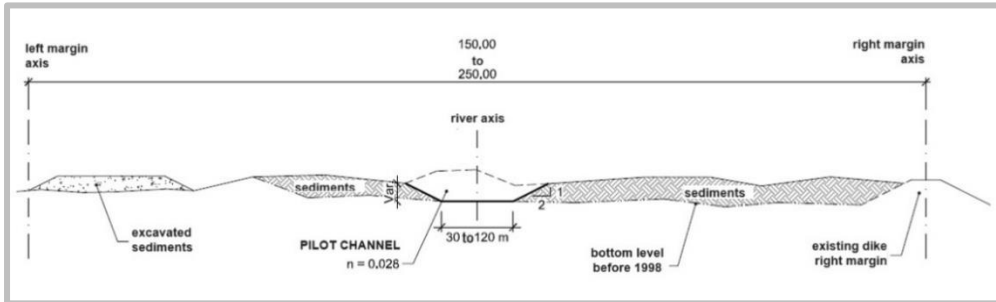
General cross section of the pilot channel through Sechura (Zegarra Dávila, 2023)
